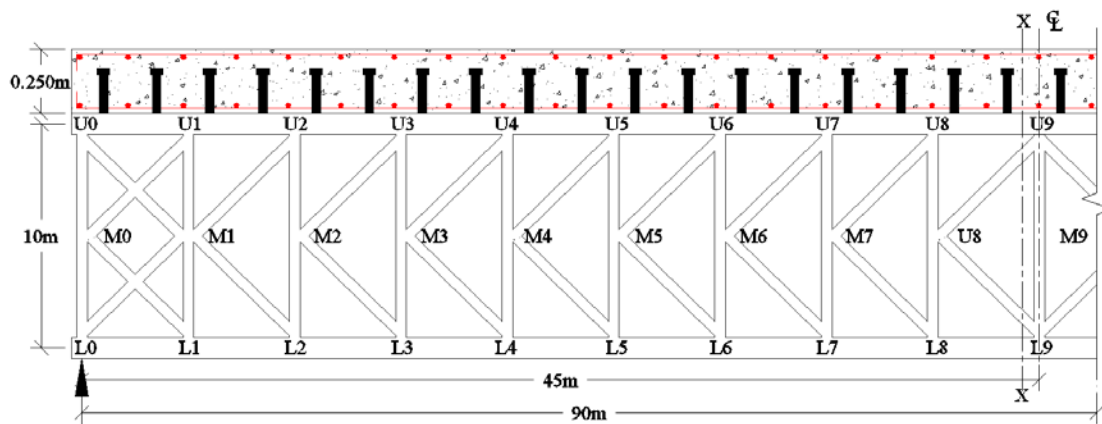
Composite truss bridge (90m span) model for plastic failure
